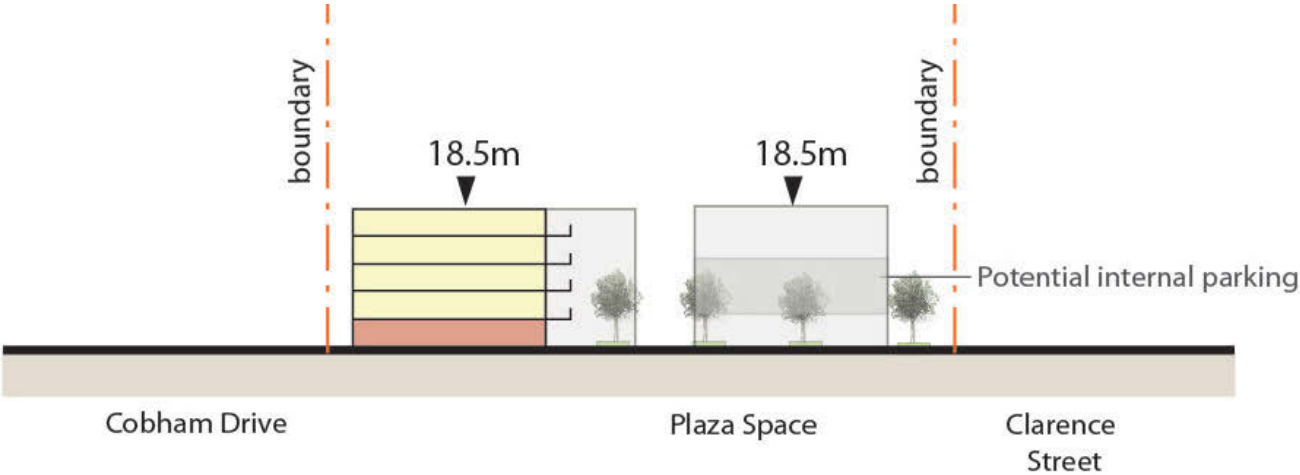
Indicative concept section B-B for Development Site 1 (not to scale)
